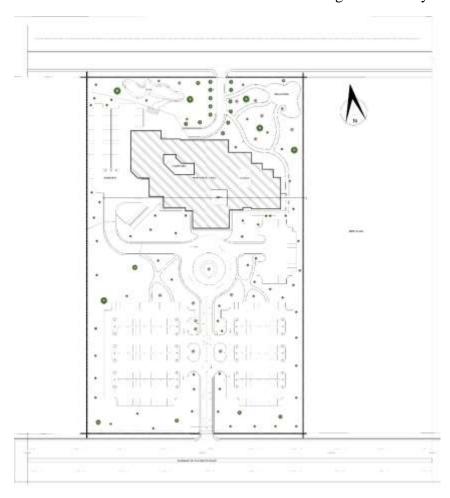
Proposed site plan for office complex Source: Authors' design (2020)
